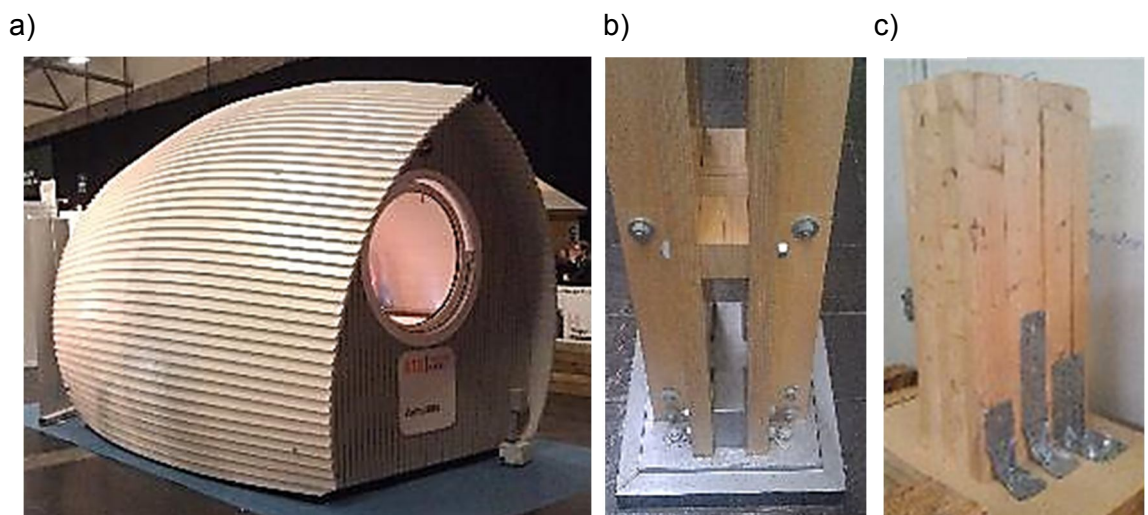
Applications and timber connection systems that can be replicated or used in G-XLam panel technologies. a) Armadilla pod at Timber Expo-2012. b) Footing connection of a Glulam column at FP innovations, Quebec. c) CLT floor to wall connection system detail.
